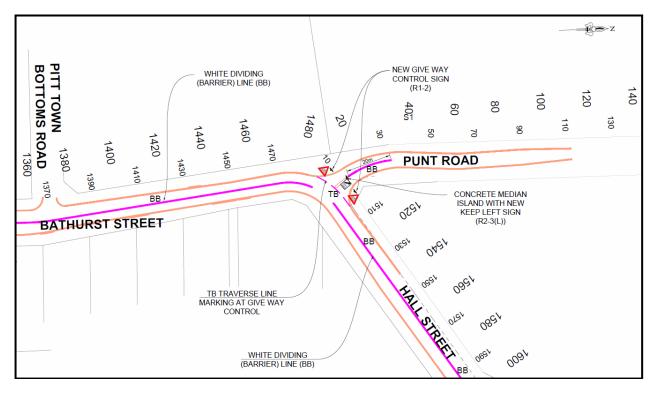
Proposed Intersection Layout for Bathurst Street - Hall Street - Punt Road
